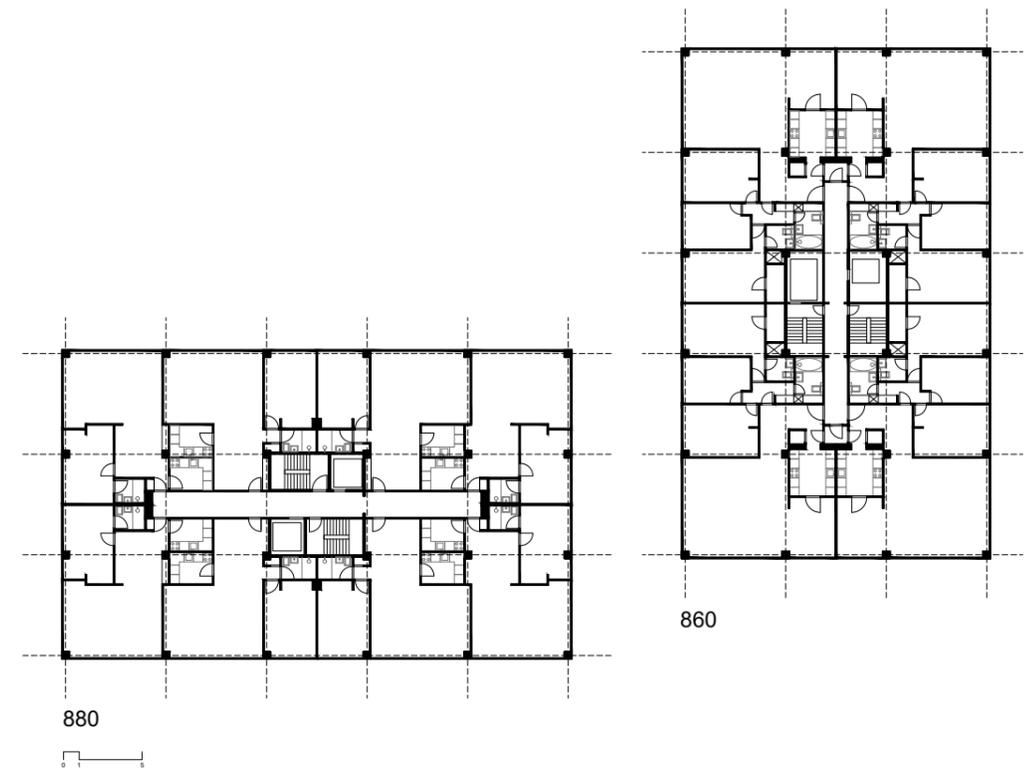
860-880 Lake Shore Drive typical floor plans
